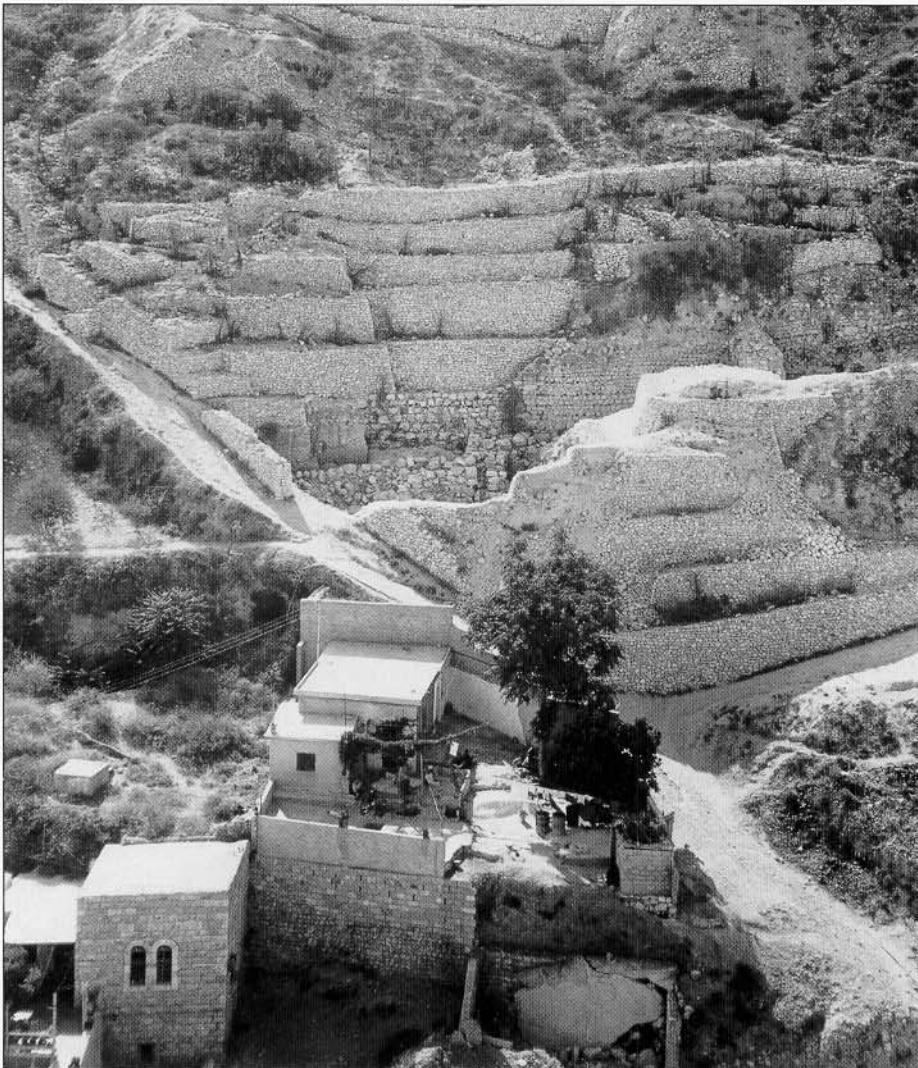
Retaining walls and houses built with stone in Jerusalem, Israel
